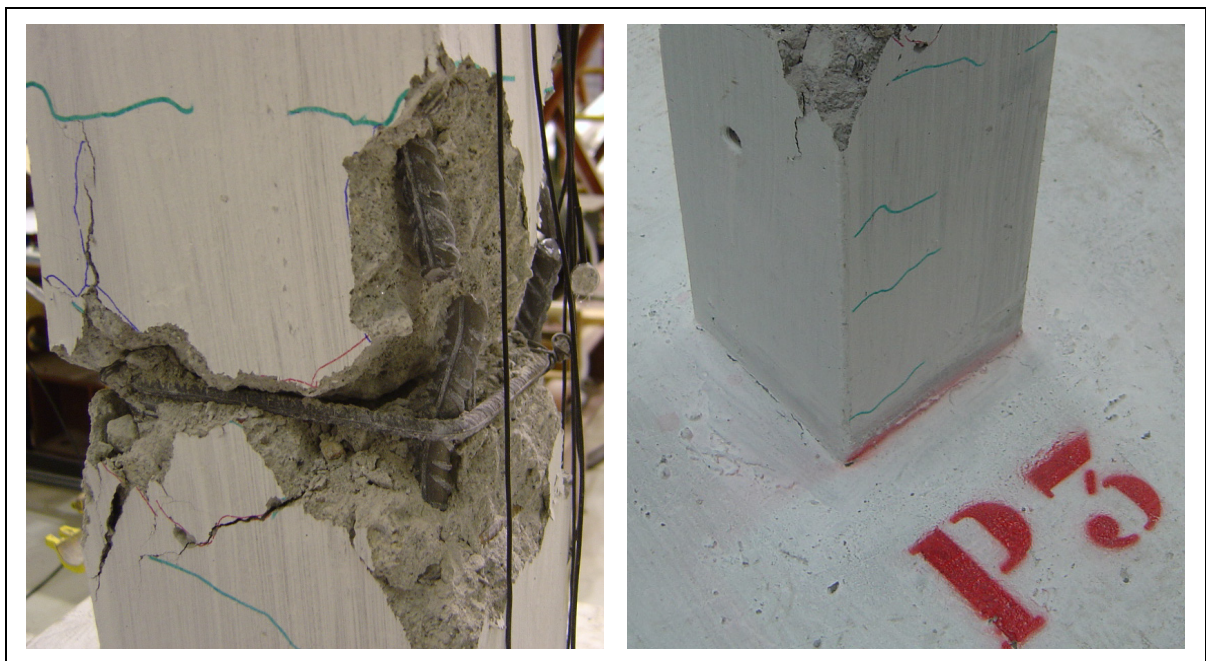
Sp. P3 – Detail of the collapse zone and of the column-foundation connection.
